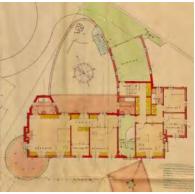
Floor plan of 327D Edgecliff Road by Leslie Wilkinson, never built. (Source: Woollahra Records, BA23/1934)
